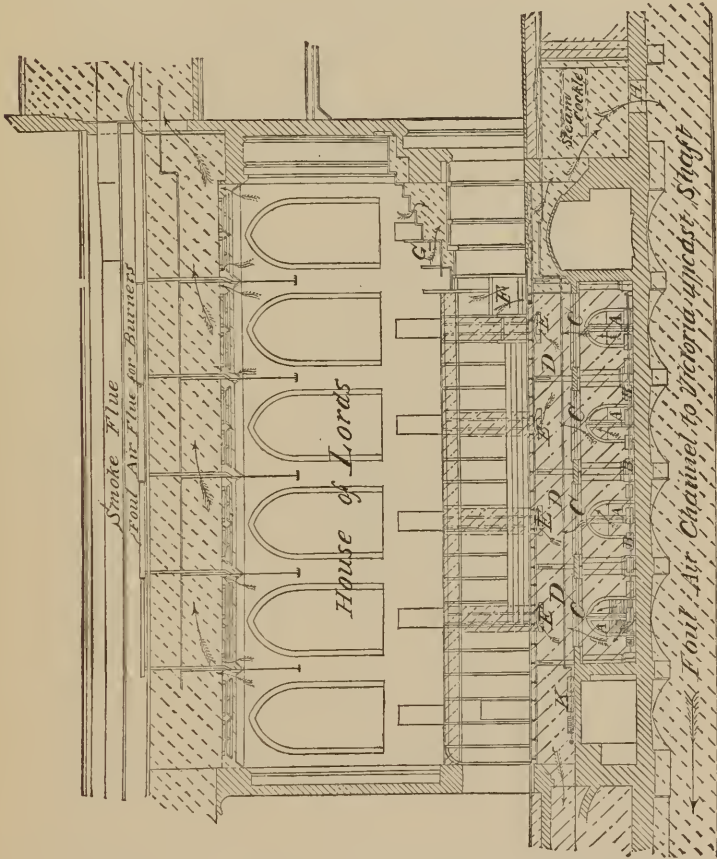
SECTIONAL ELEVATION OF THE HOUSE OF LORDS, SHOWING WARMING AND VENTILATING ARRANGEMENTS.
